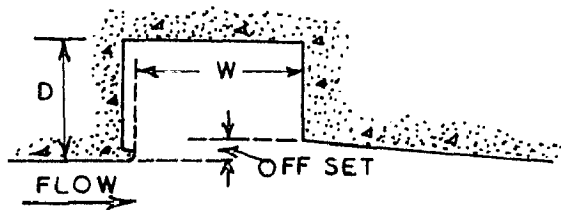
SLOT WITH OFF-SET AT DOWN STREAM CORNER AND CONVERGENT DOWN STREAM WALL
